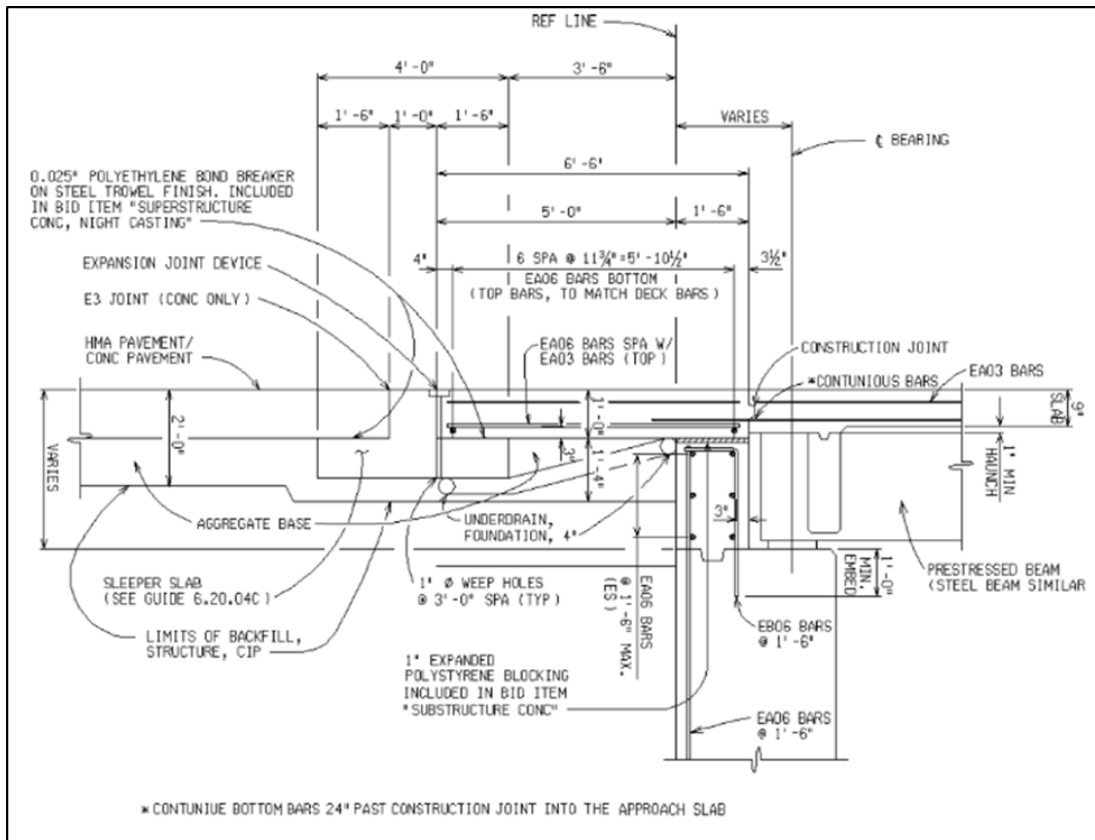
Deck Sliding over Backwall (Aktan and Attanayake 2011)
